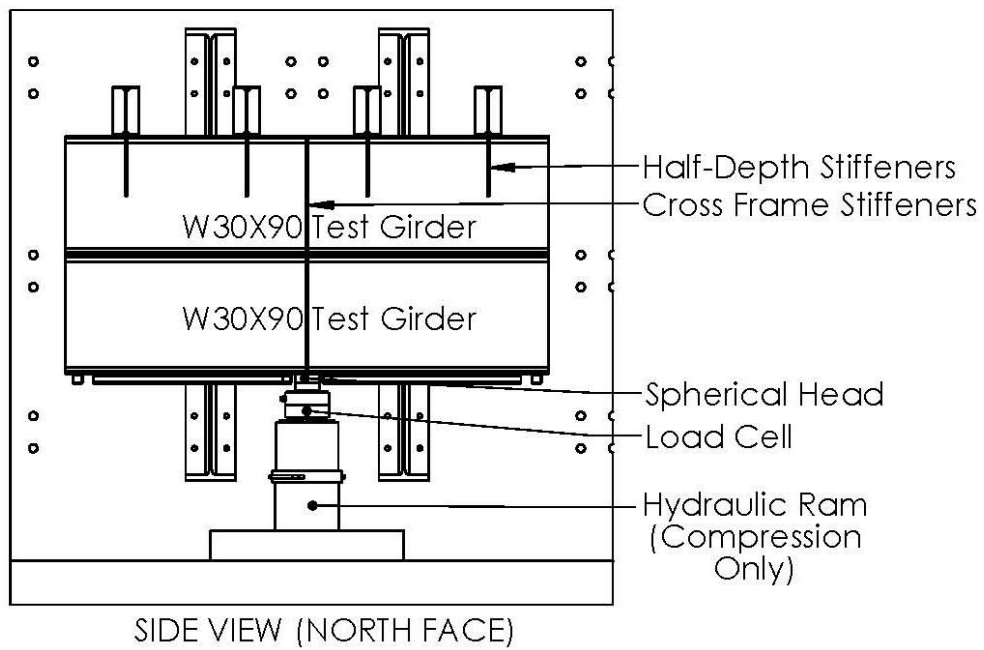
Side View of Cross Frame Fatigue Setup (Details)
